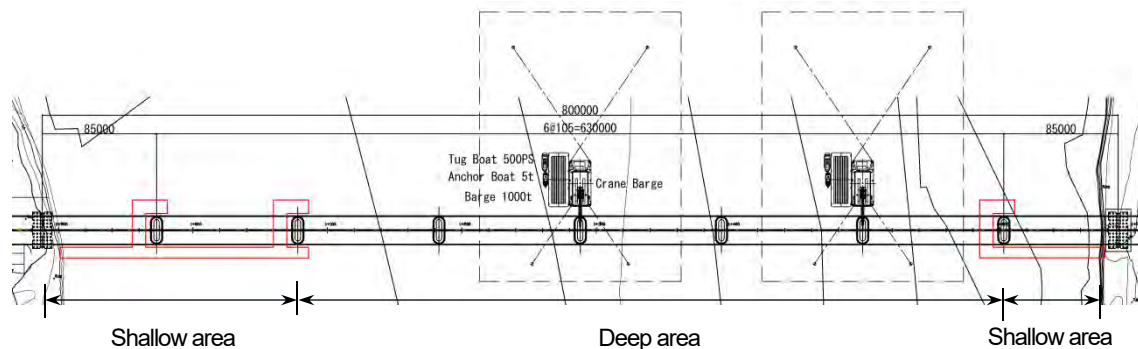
Typical Layout of Temporary Jetty and Barges during SPSP Construction
